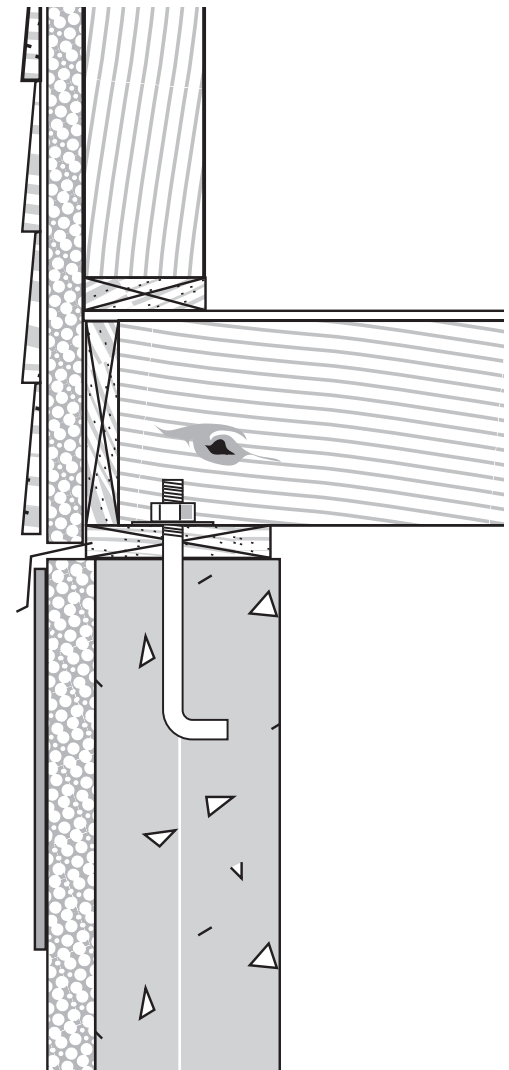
Tying the foundation wall to the sill plate using a J-bolt.
